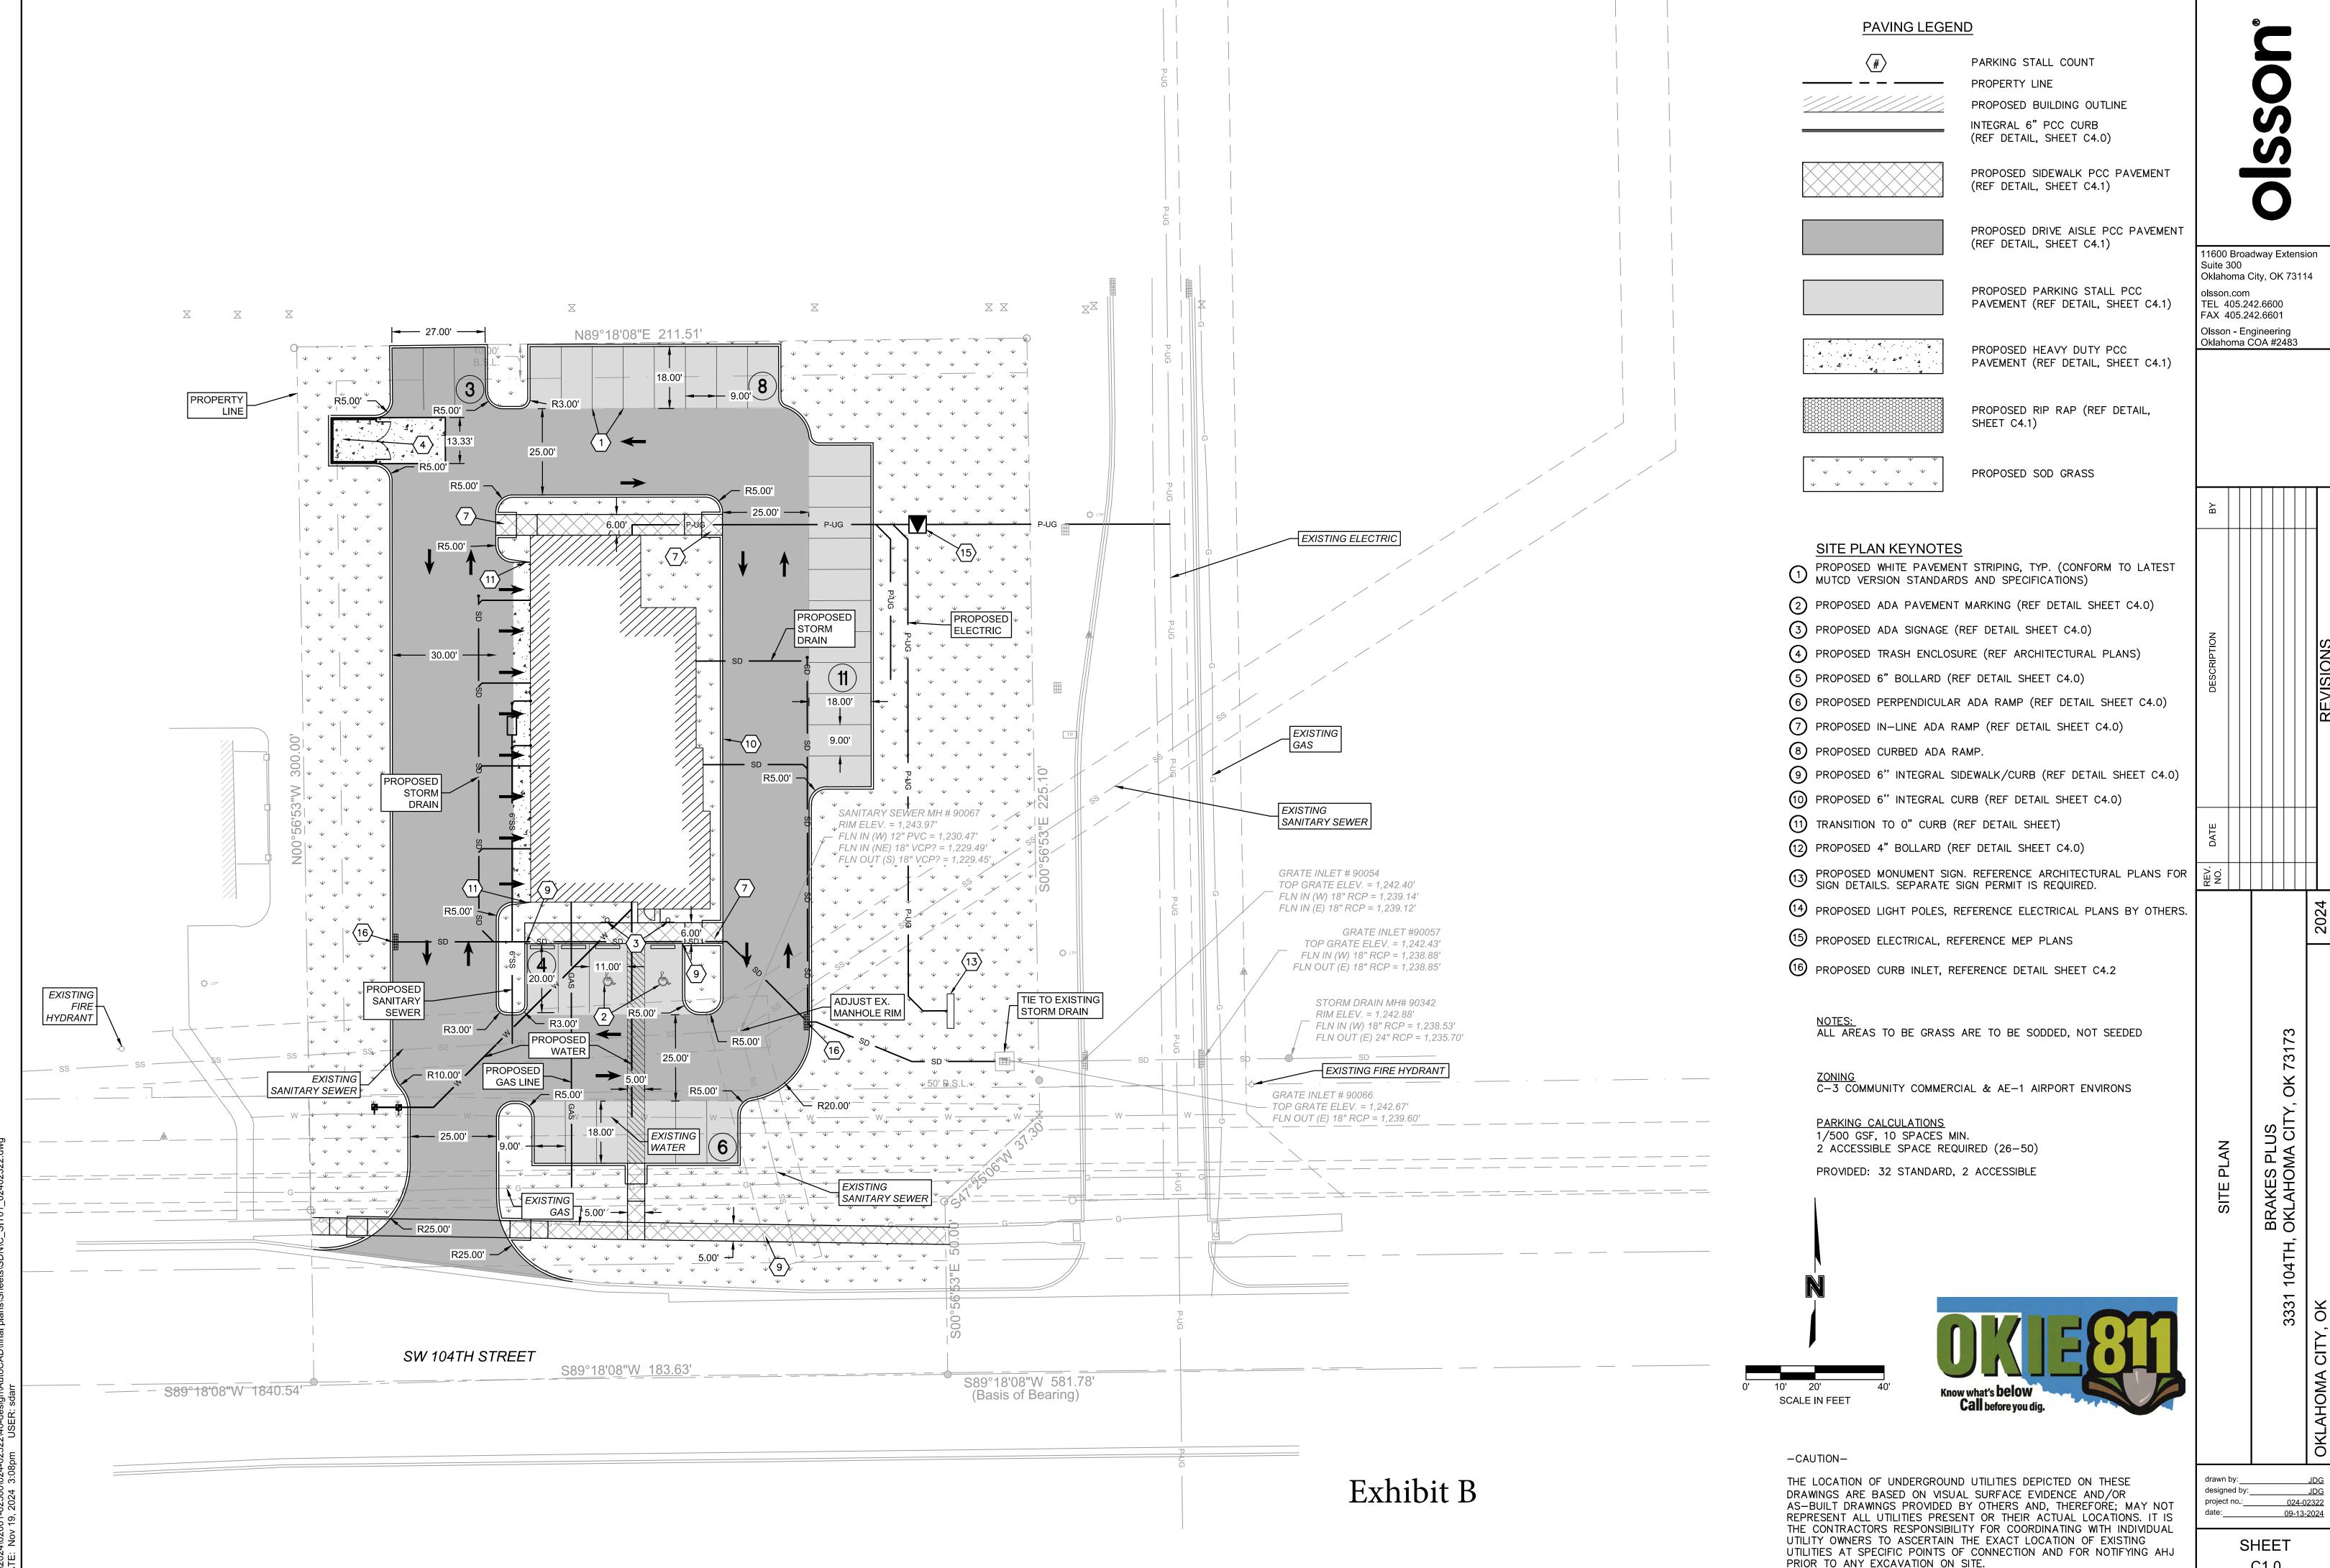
Exhibit A: Legal Description Exhibit B: Conceptual Site Plan
